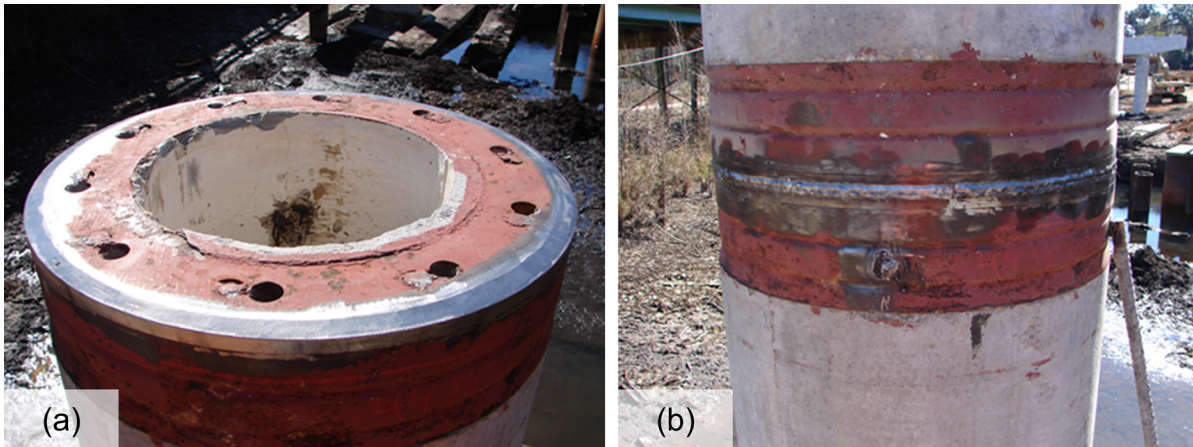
Welded ICP splice: (a) beveled steel fitting and (b) welded splice.
